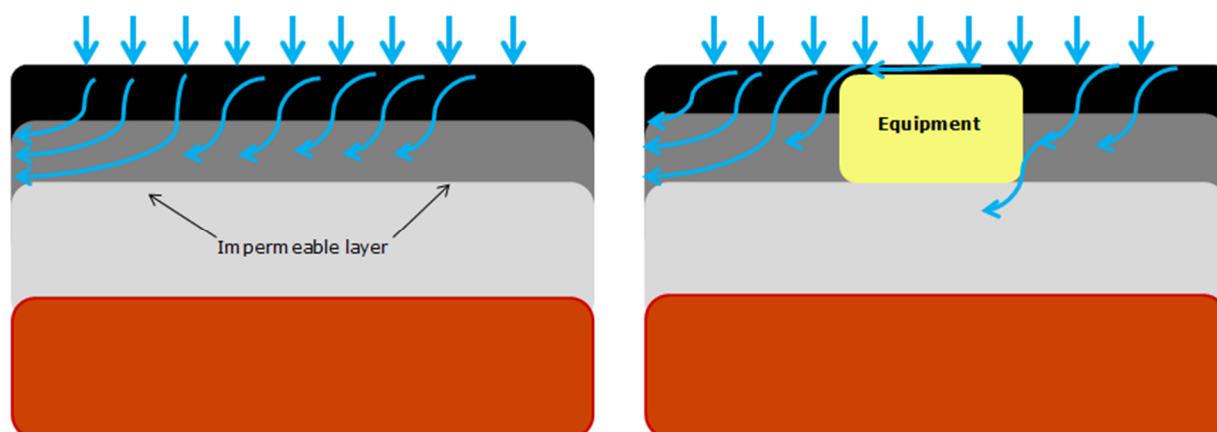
Obstruction of pavement drainage caused by installation of equipment, allowing water to get into the lower layers of the road structure.
